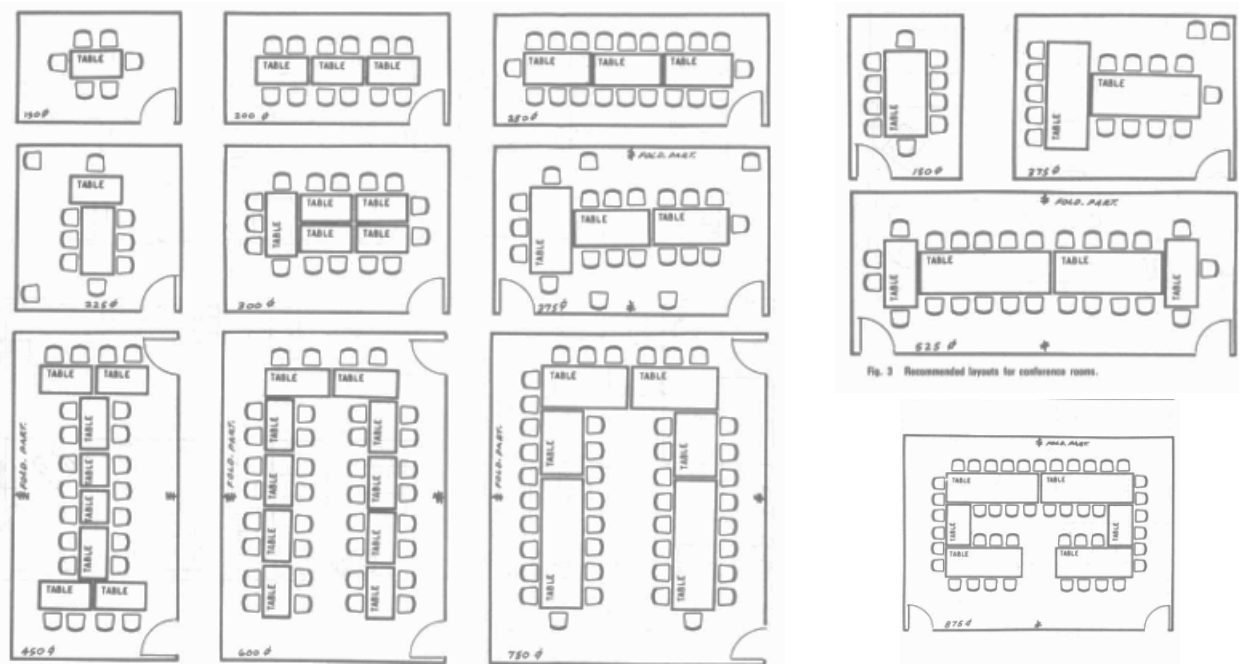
CONFERENCE AND MEETING ROOMS LAYOUT
